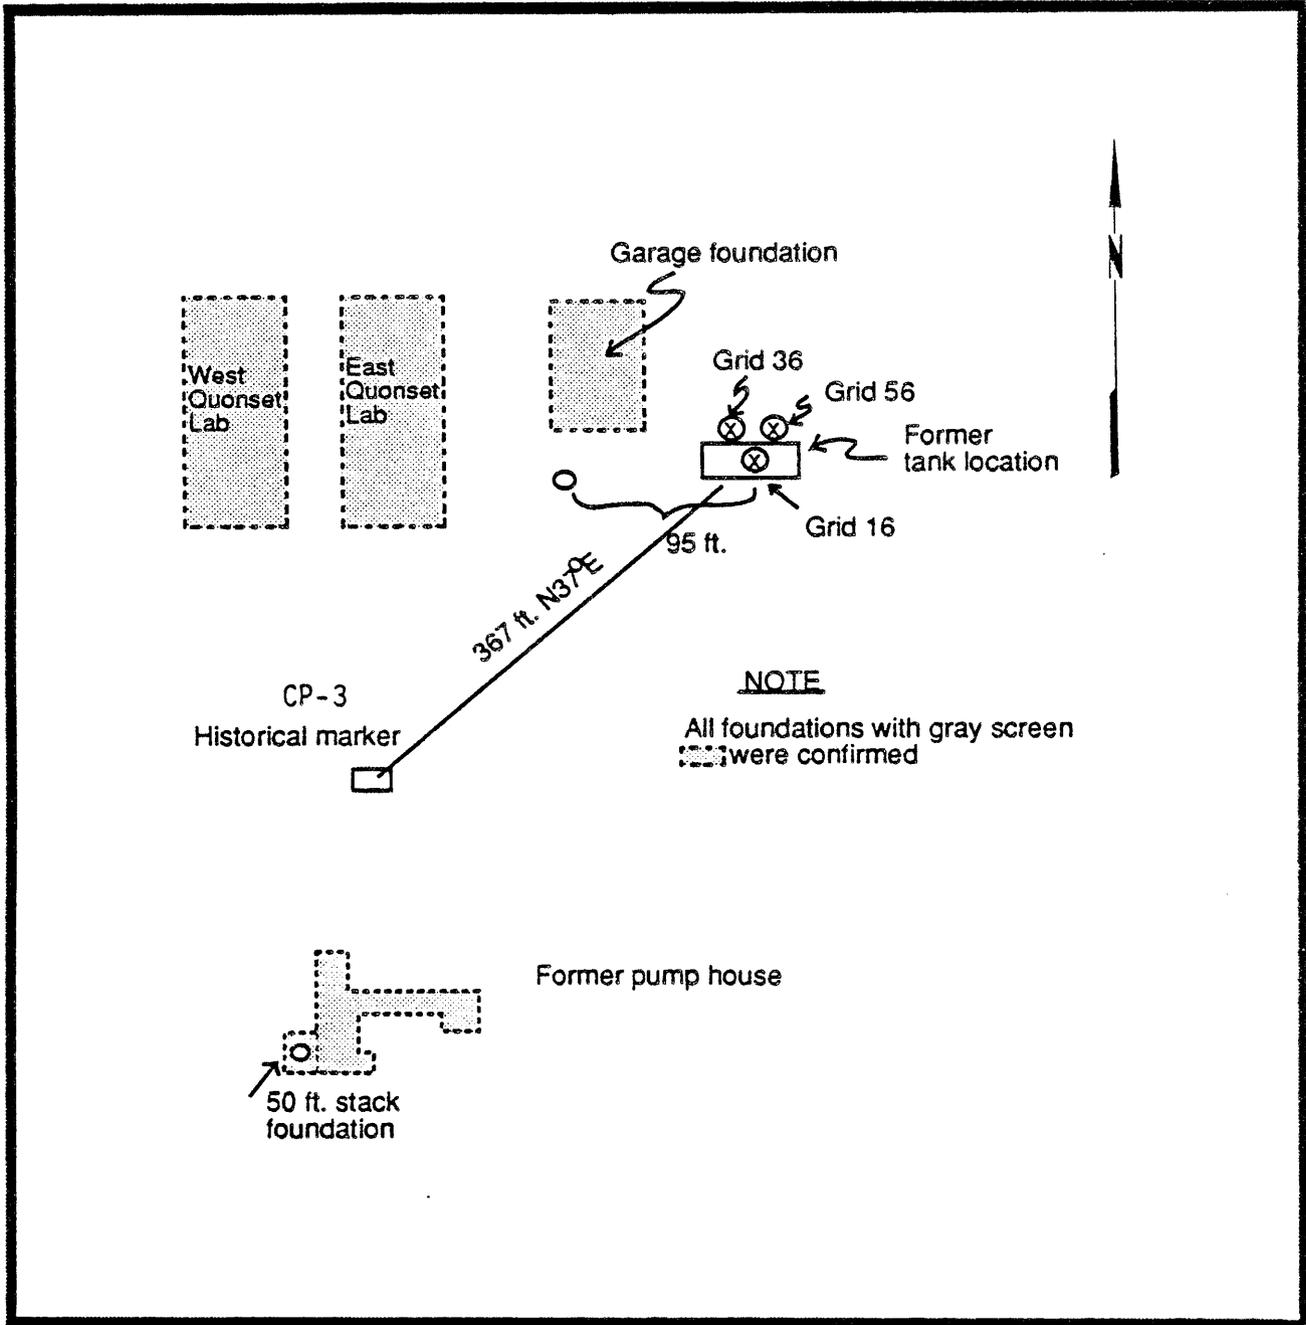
Underground Gasoline Tank at Site A (Request 814)
